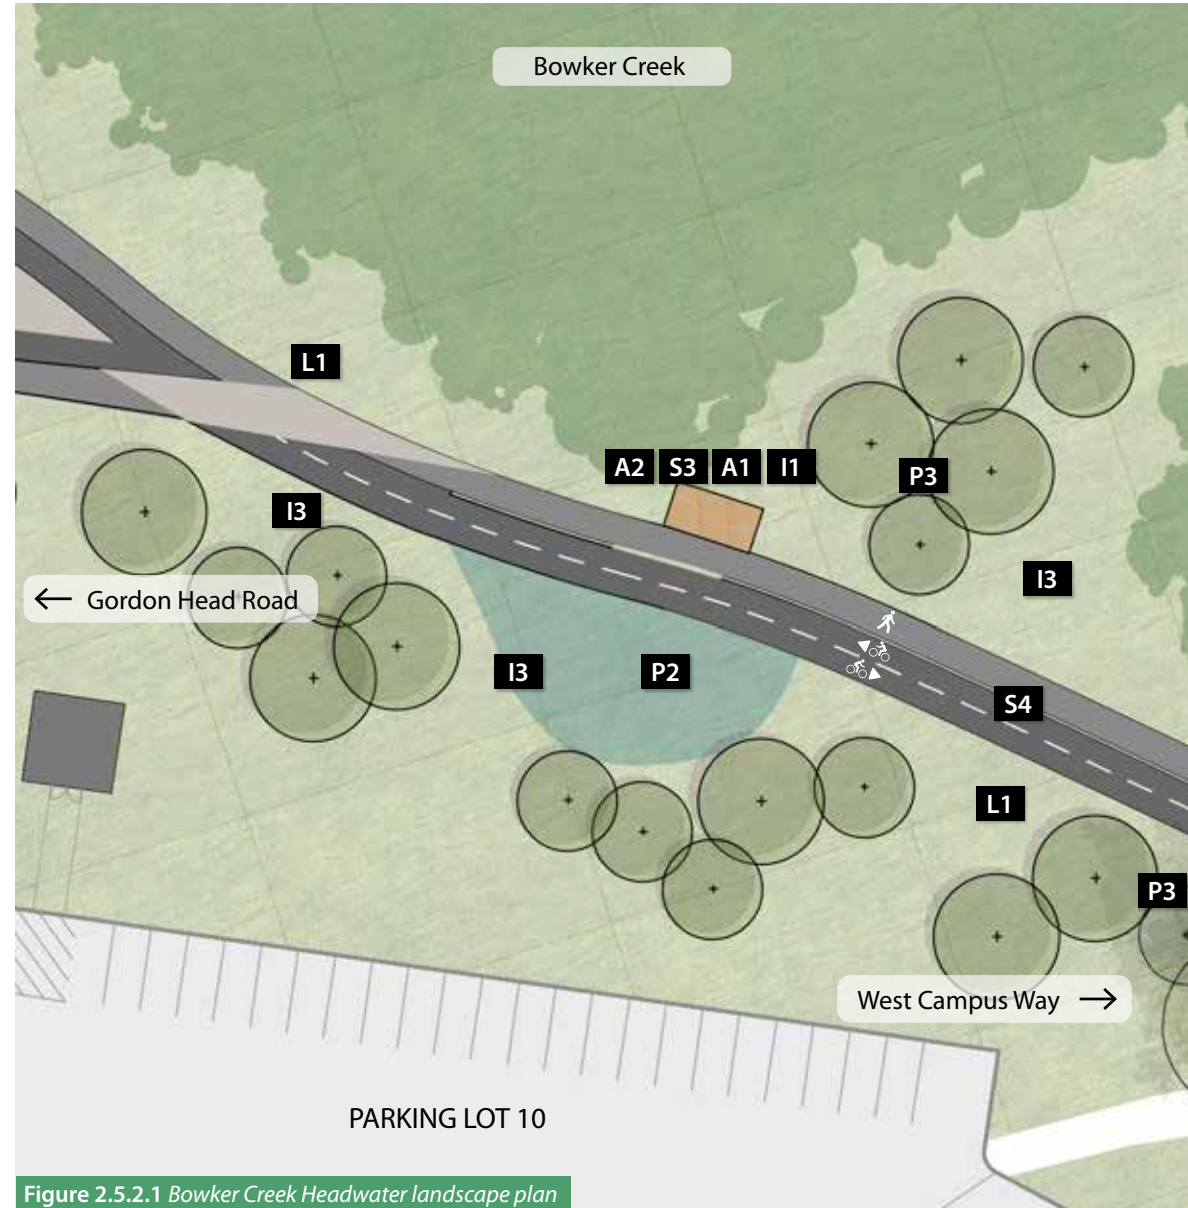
Bowker Creek Headwater landscape plan
